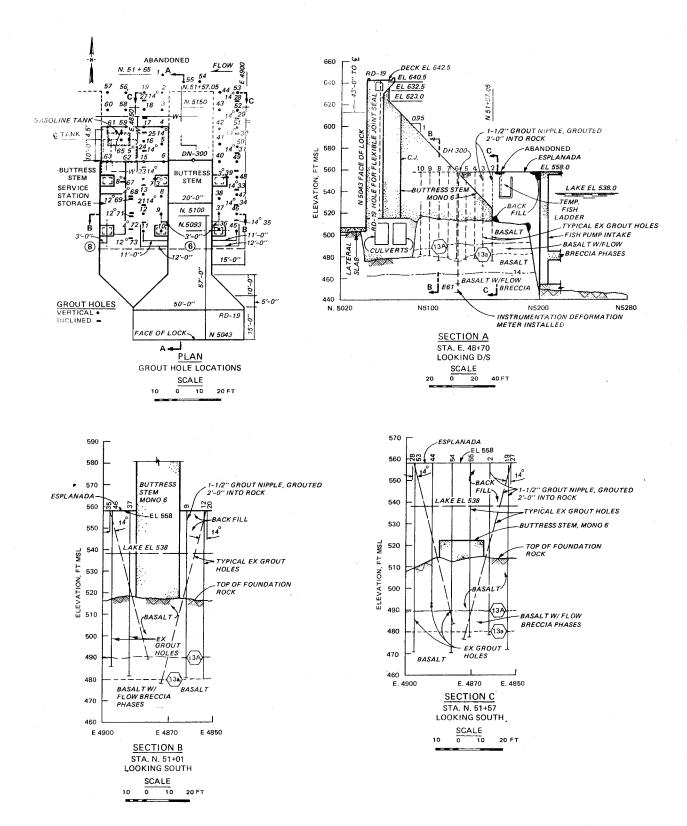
Stabilization plan and sections, Little Goose Lock and Dam
